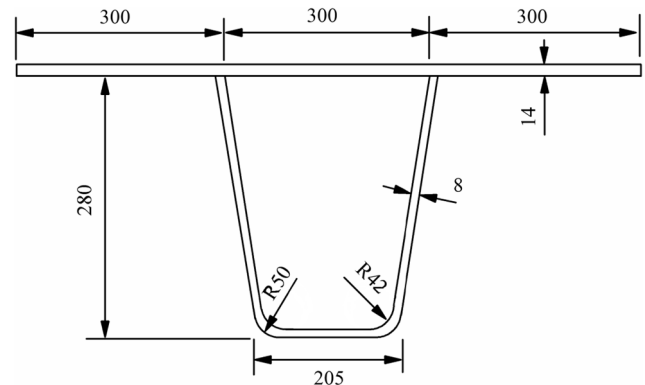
Detail cross section of orthotropic steel deck (unit: mm).
